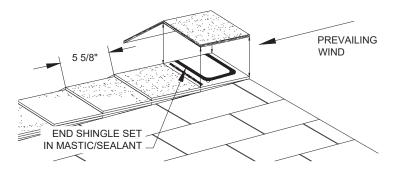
Installation of RidgeFlex® Shingles; End Cap Set in Mastic
